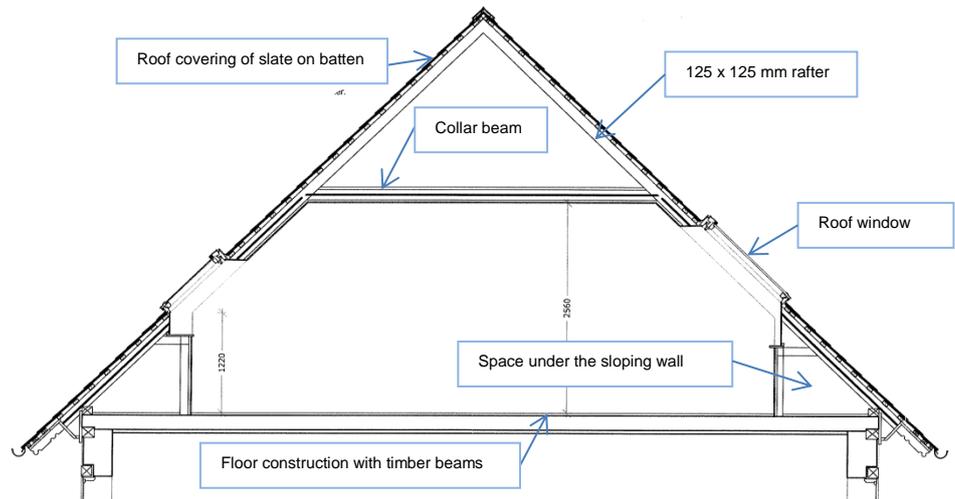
Cross section of attic before the refurbishment. Collar beam, roof windows and space under the sloping wall and a floor construction made of timber beams. Roof covering of slate on batten. 125 x 125 mm rafter with laths and plaster.
